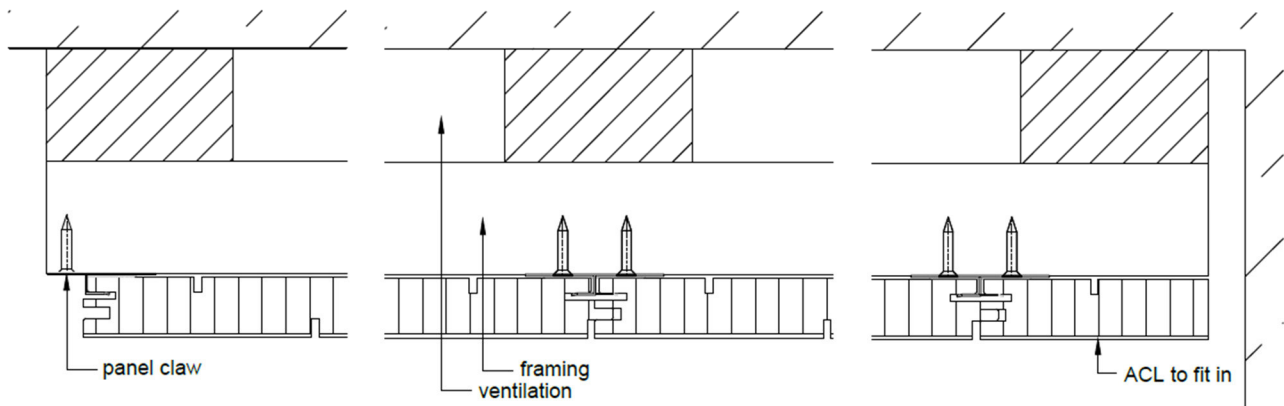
Horizontal cut of a vertical assembly with panel claws
